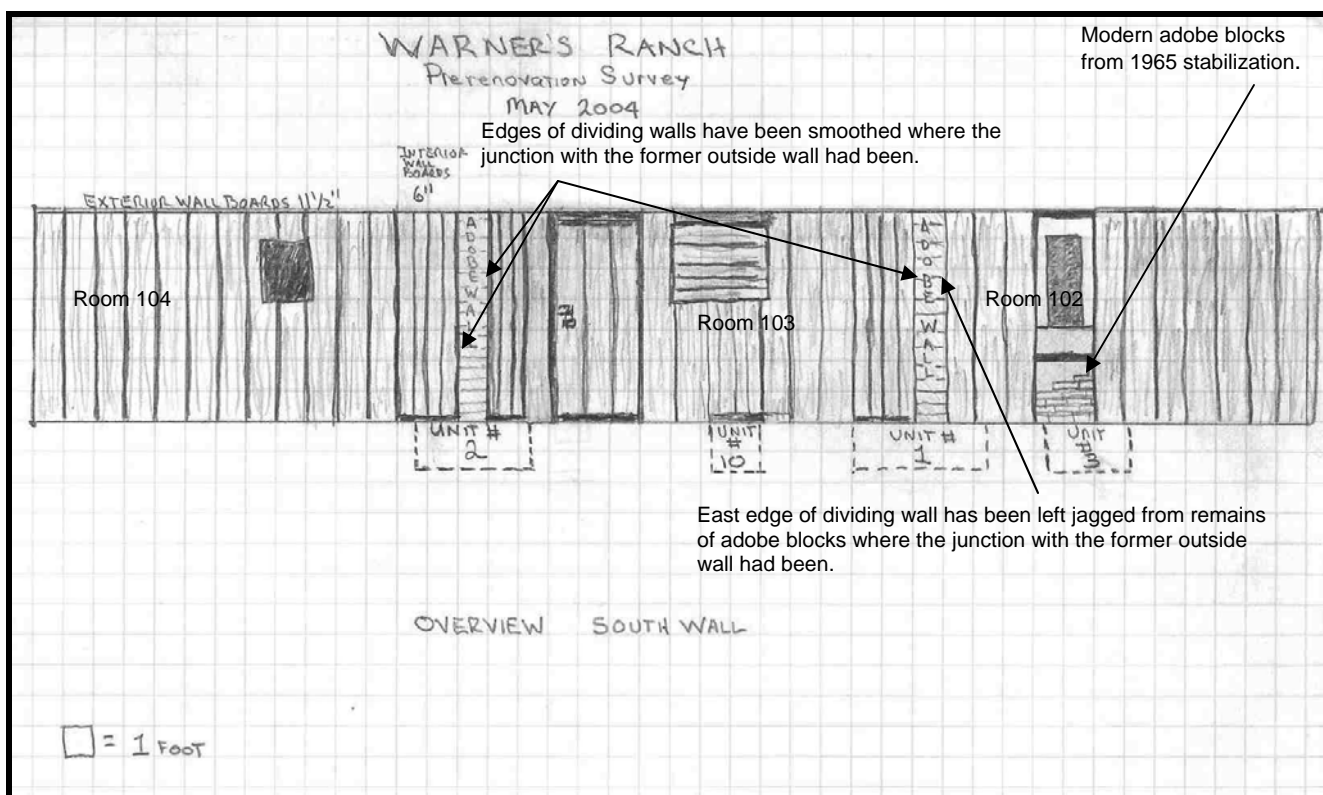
Sketch of south wall showing 2004 exterior unit placements.
